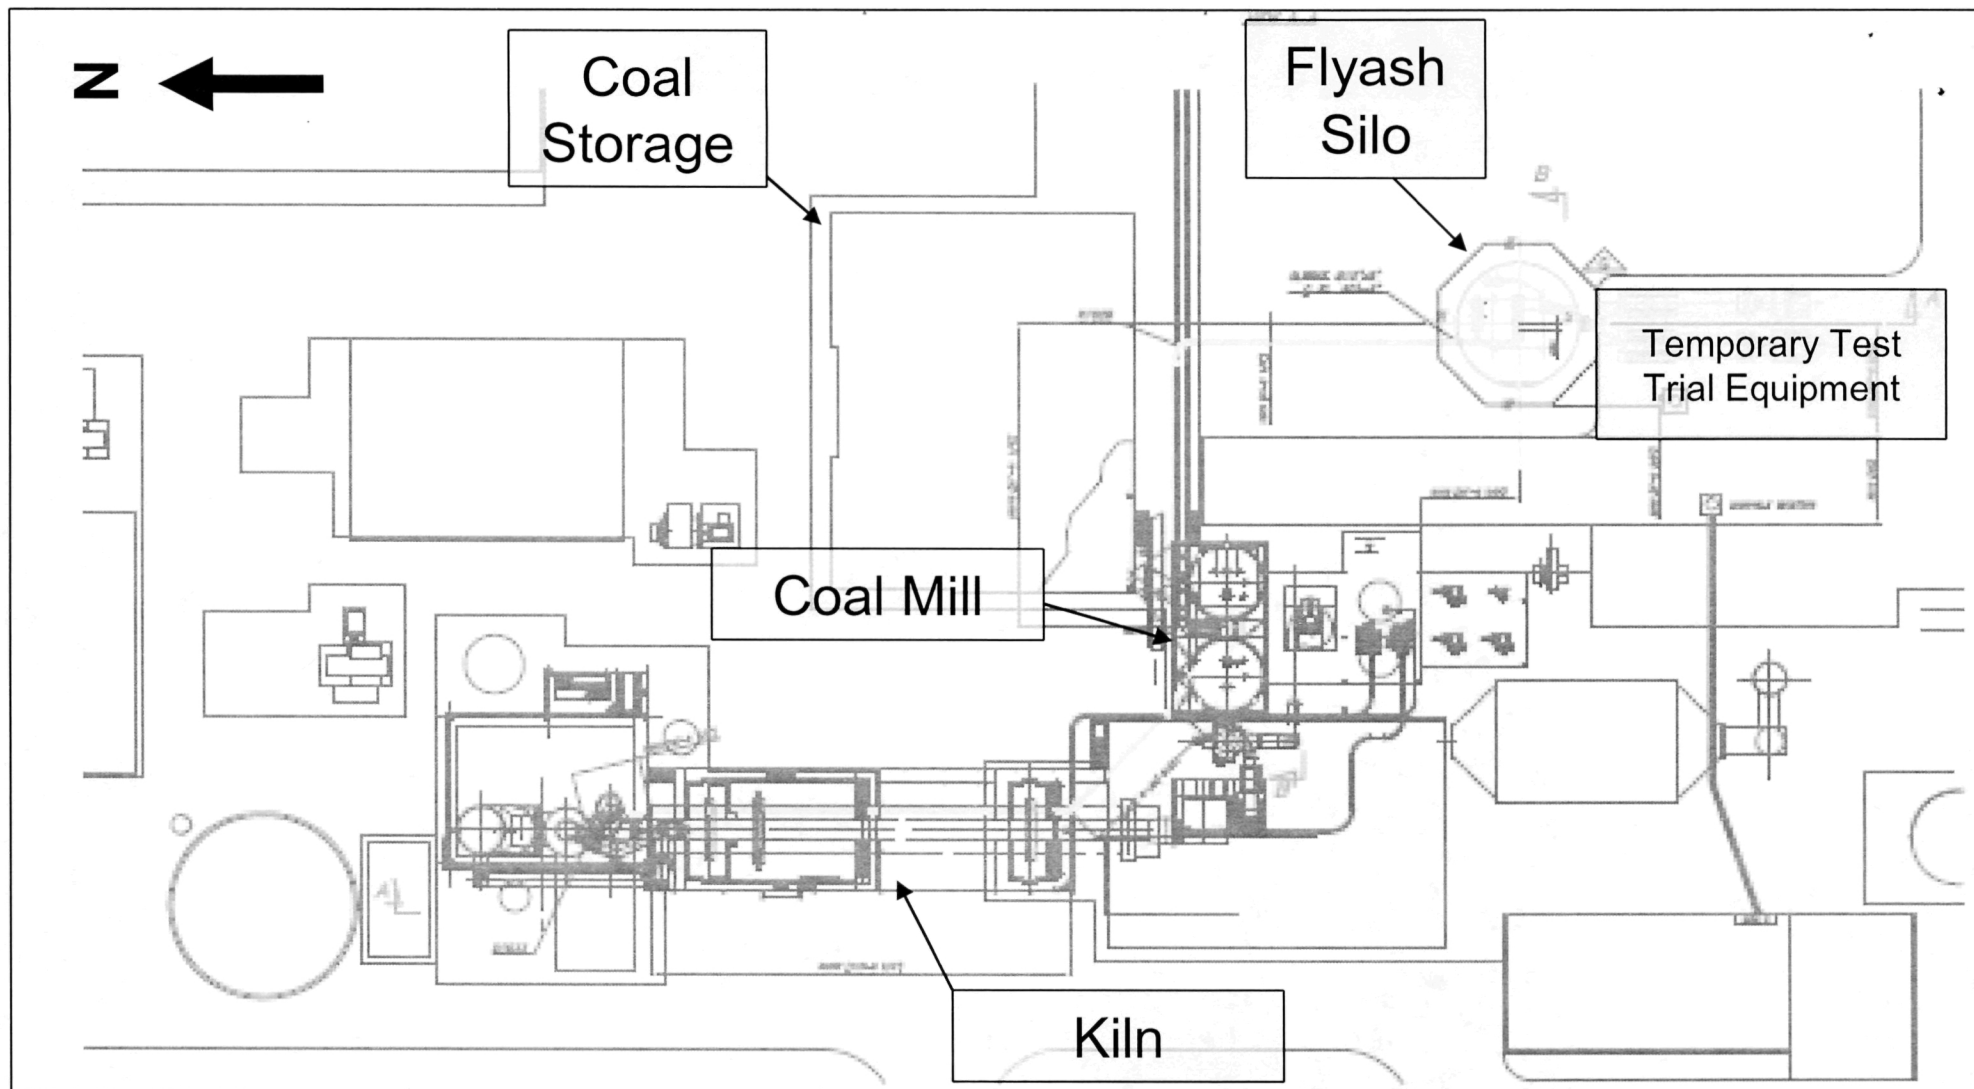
Overview layout of SAC facility and proposed location of test trial equipment.
